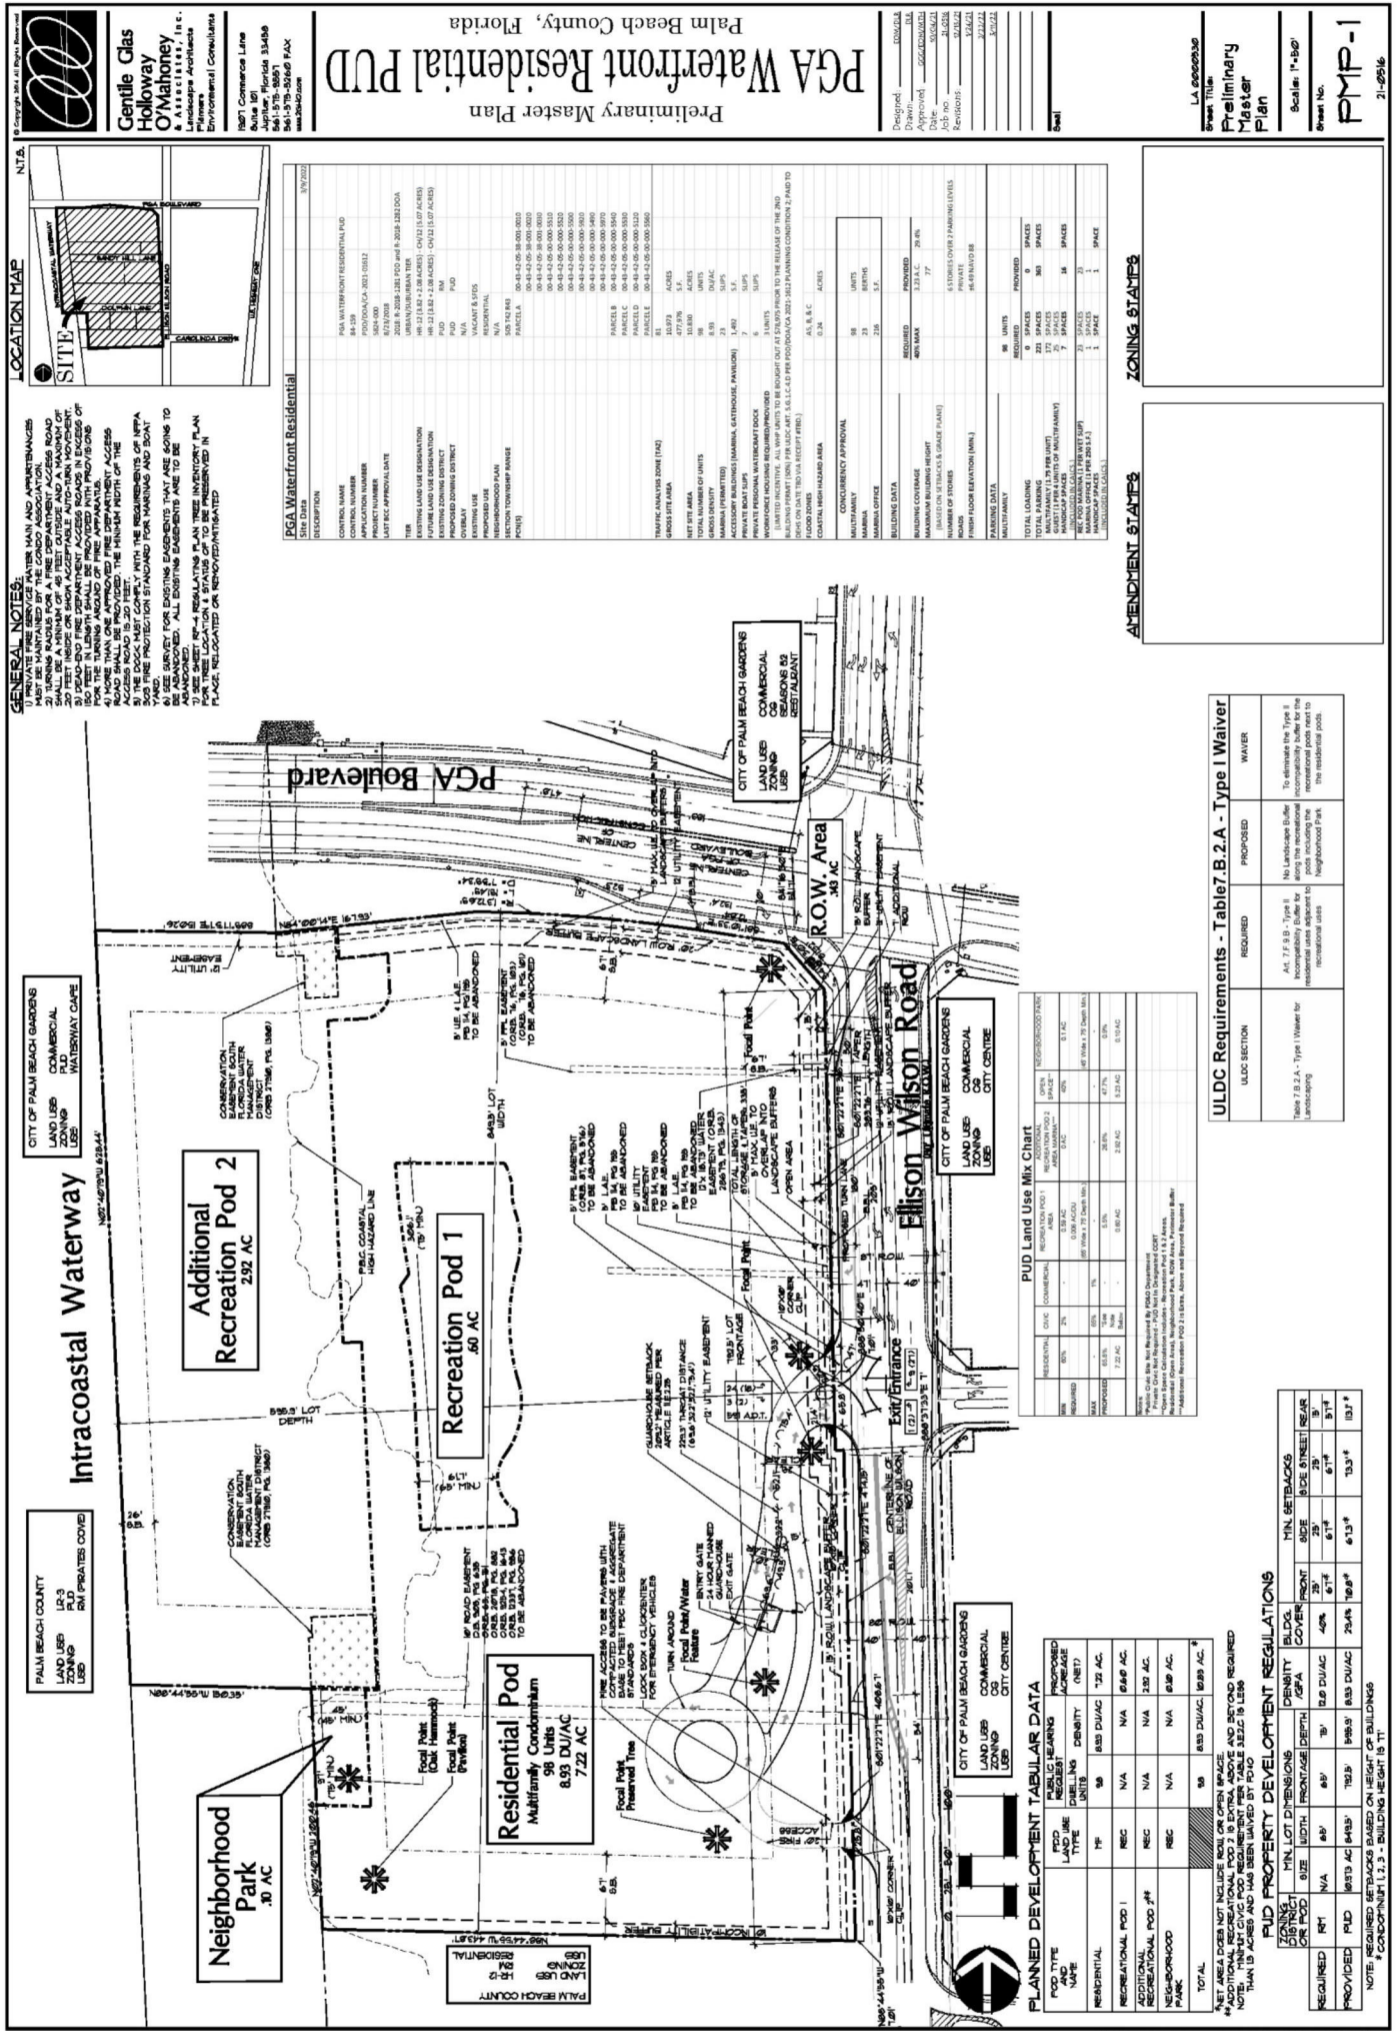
Preliminary Site Plan dated March 11, 2022, page-2 of 5
